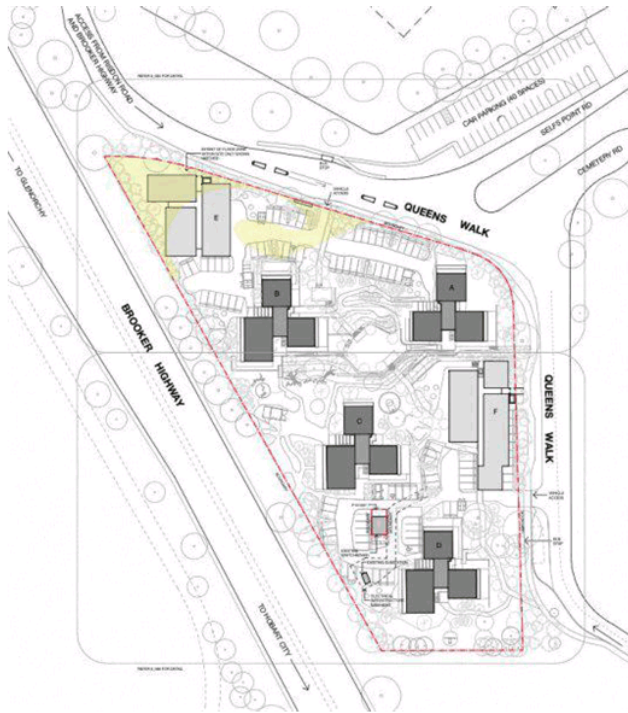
Proposed Development. Building A-D are existing multi story buildings.
